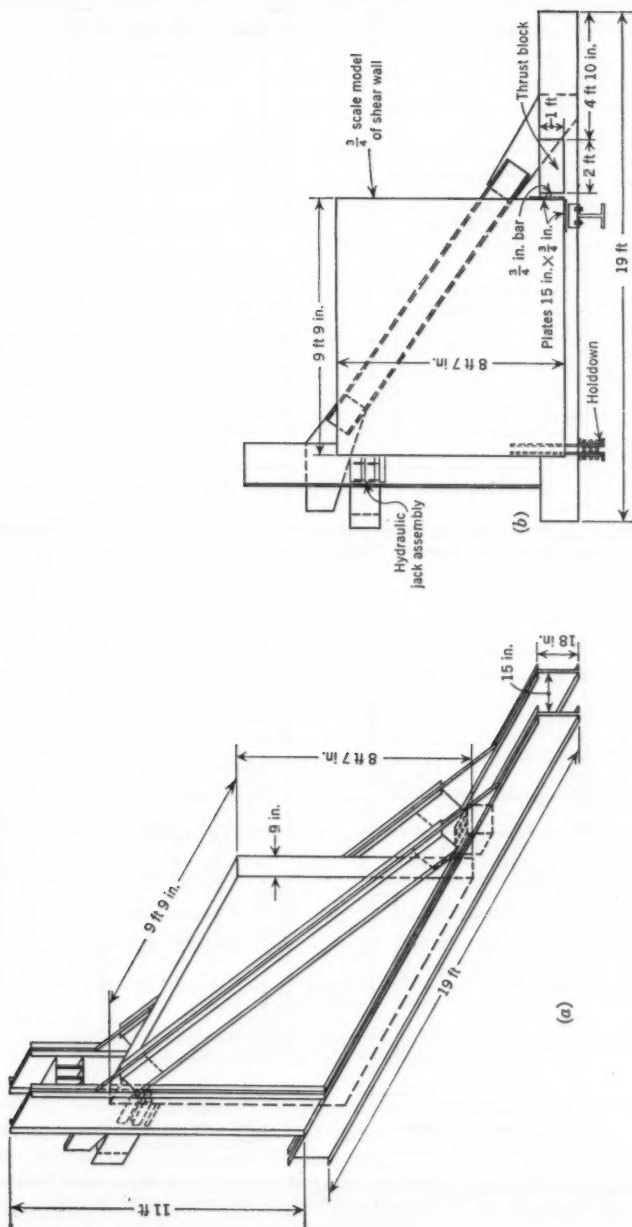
TYPE C SPECIMEN IN 300-KIP SHEAR JIG
